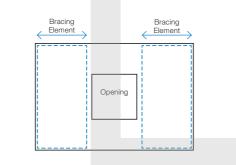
LARGE OPENINGS AND BRACING ELEMENTS
